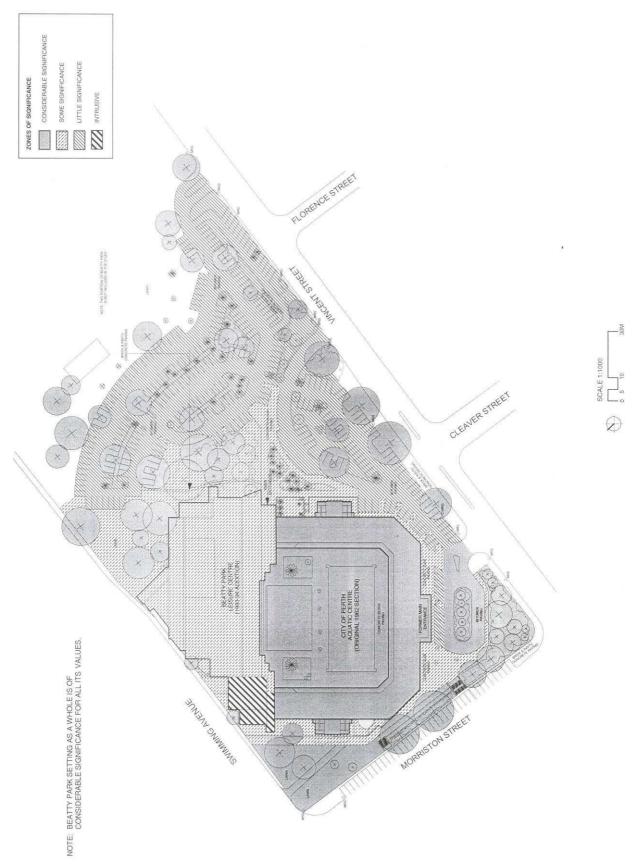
Beatty Park Leisure Centre – Site Plan (Zones of Significance).
